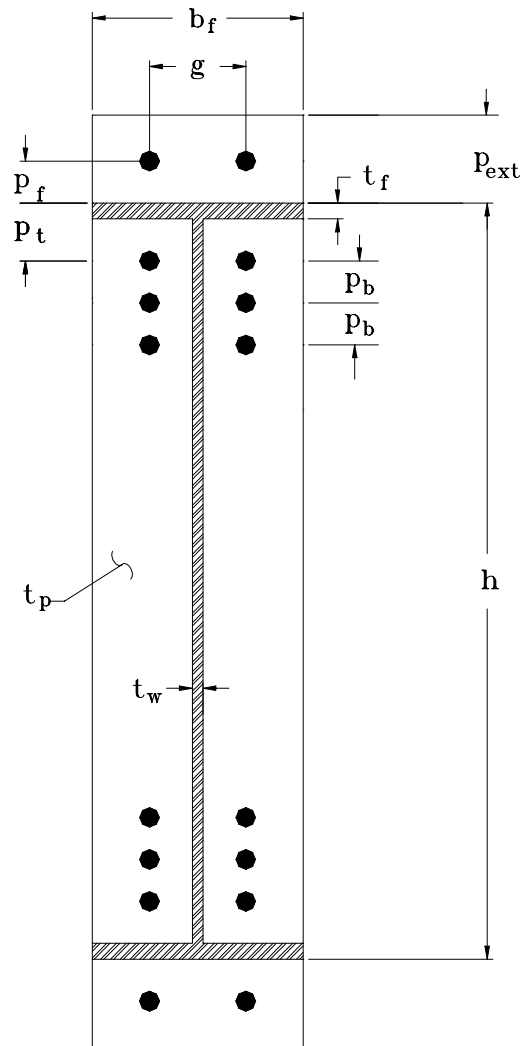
Multiple Row 1/3 Extended Moment End-Plate Details
